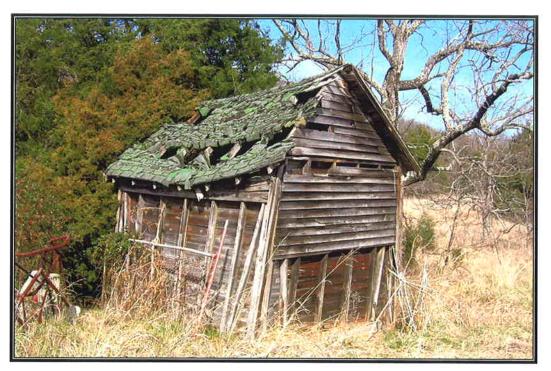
Site 3, Southeast and rear elevations of the outbuilding.
